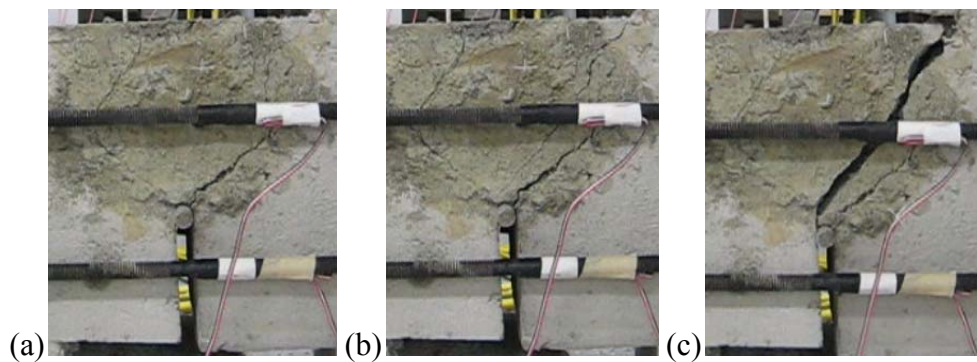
Shear unreinforced welded tie tested cracking sequence.
